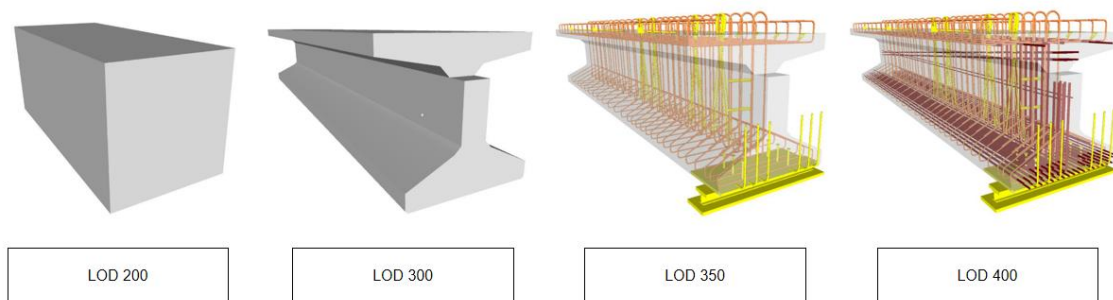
Level of Development of Railway Bridge Precast Structural I Girder (see [55])
